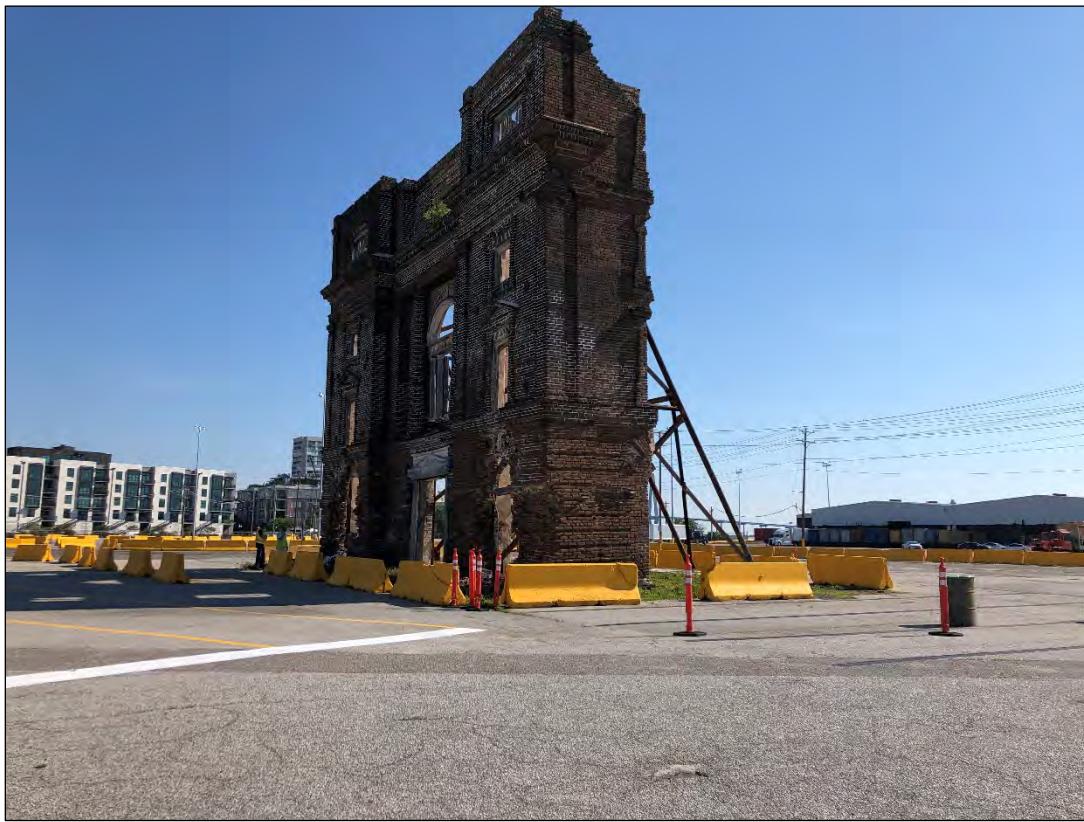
Bennett's Rice Mill facade, facing northeast.
